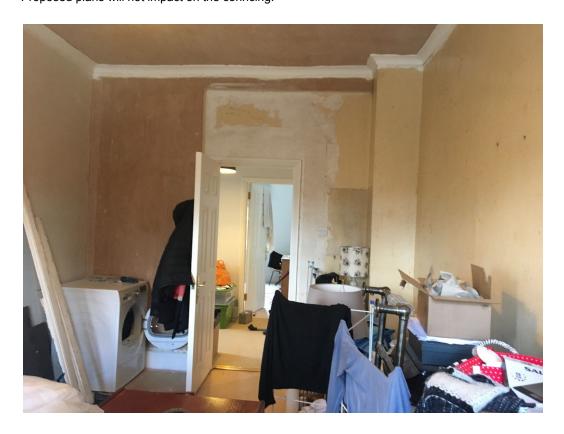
View of bedroom inside first floor flat. The walls to the left and rear of the photograph and doorway were built in the 1970s. The coving and skirting was also added in the 1970s conversion. It is proposed to build a new stud wall here to form the new entrance lobby.
